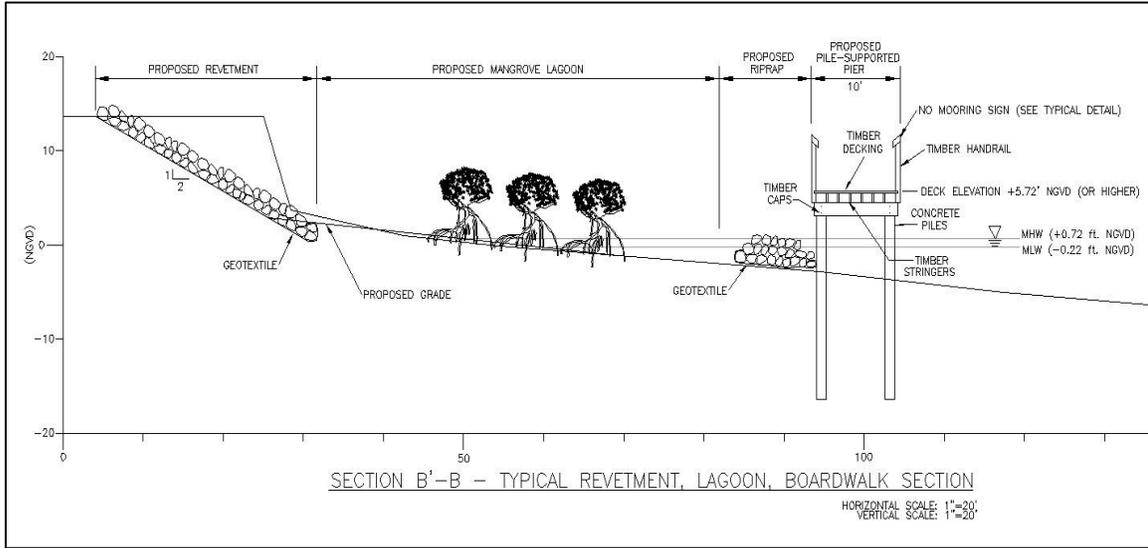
Typical Section (Revetment, Sill, Boardwalk)
